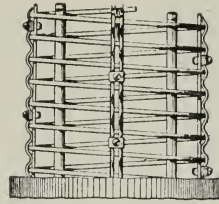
Column Reinforcement Used by the American System of Reinforcing for Concrete Construction, Chicago, Ill.
